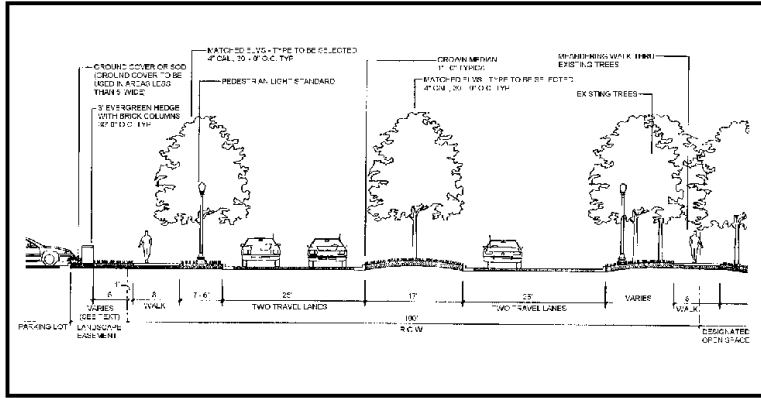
Bear Creek Parkway (Divided Cross Section)
